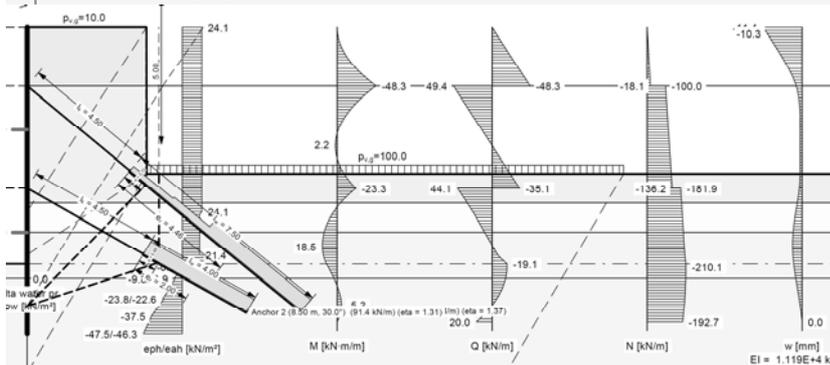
Example of excavation stability analysis with second row of anchors next to Hites building
